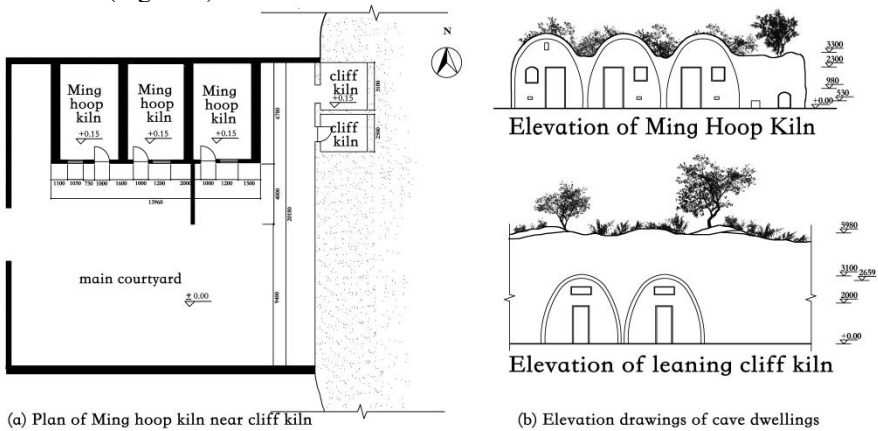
Plane elevation of open hoop kiln near cliff kiln. Source: Author drawing.
